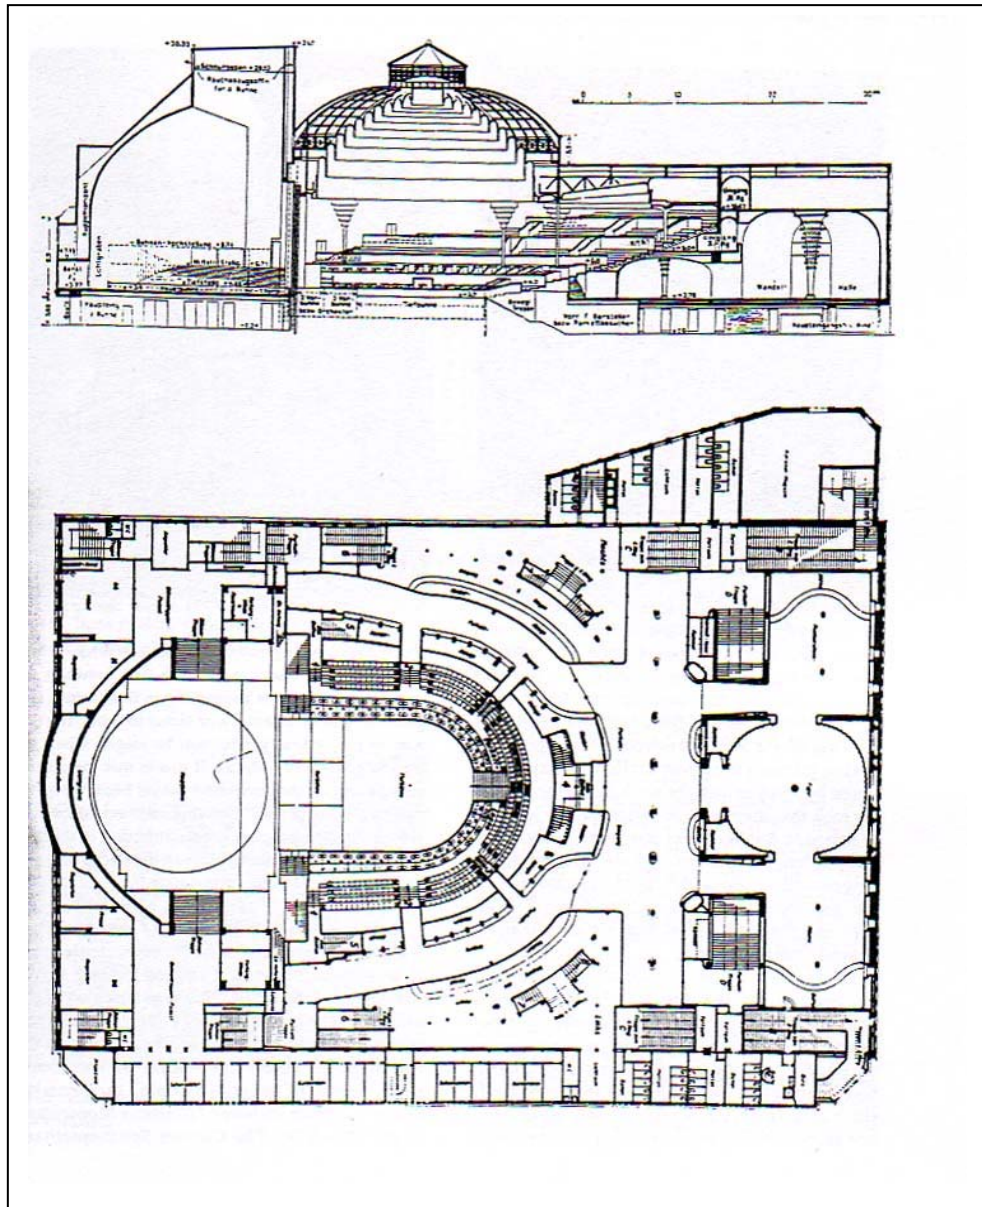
Section and plan of the Schauspielhaus in Berlin by Hans Poelzig, Berlin, 1919-1920
